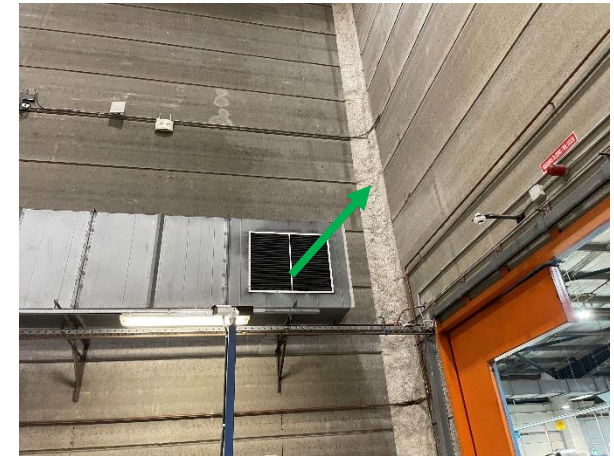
Main Warehouse – non-asbestos containing vermiculite to the steel framework within the west portion
